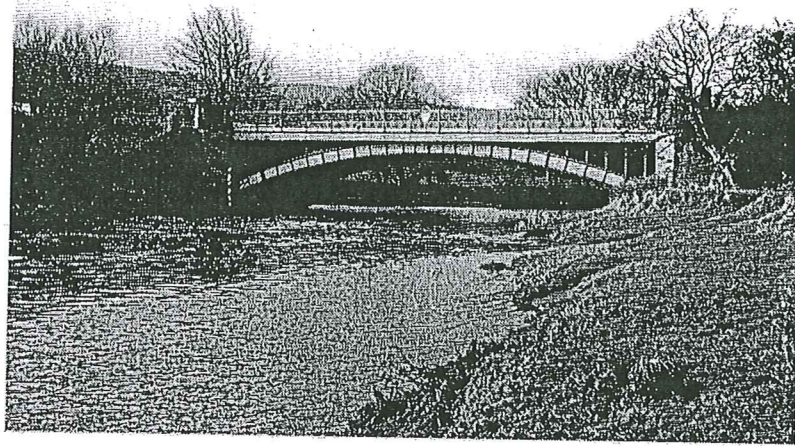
ILKLEY BRIDGE AND BOLTON BRIDGE
